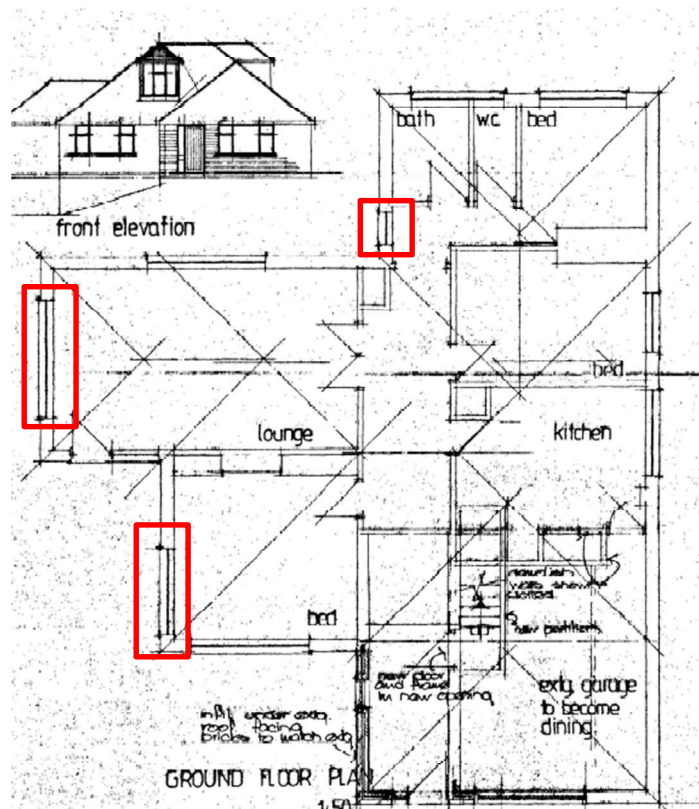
Ground Floor Plan of Hollybank with identified windows in red.
